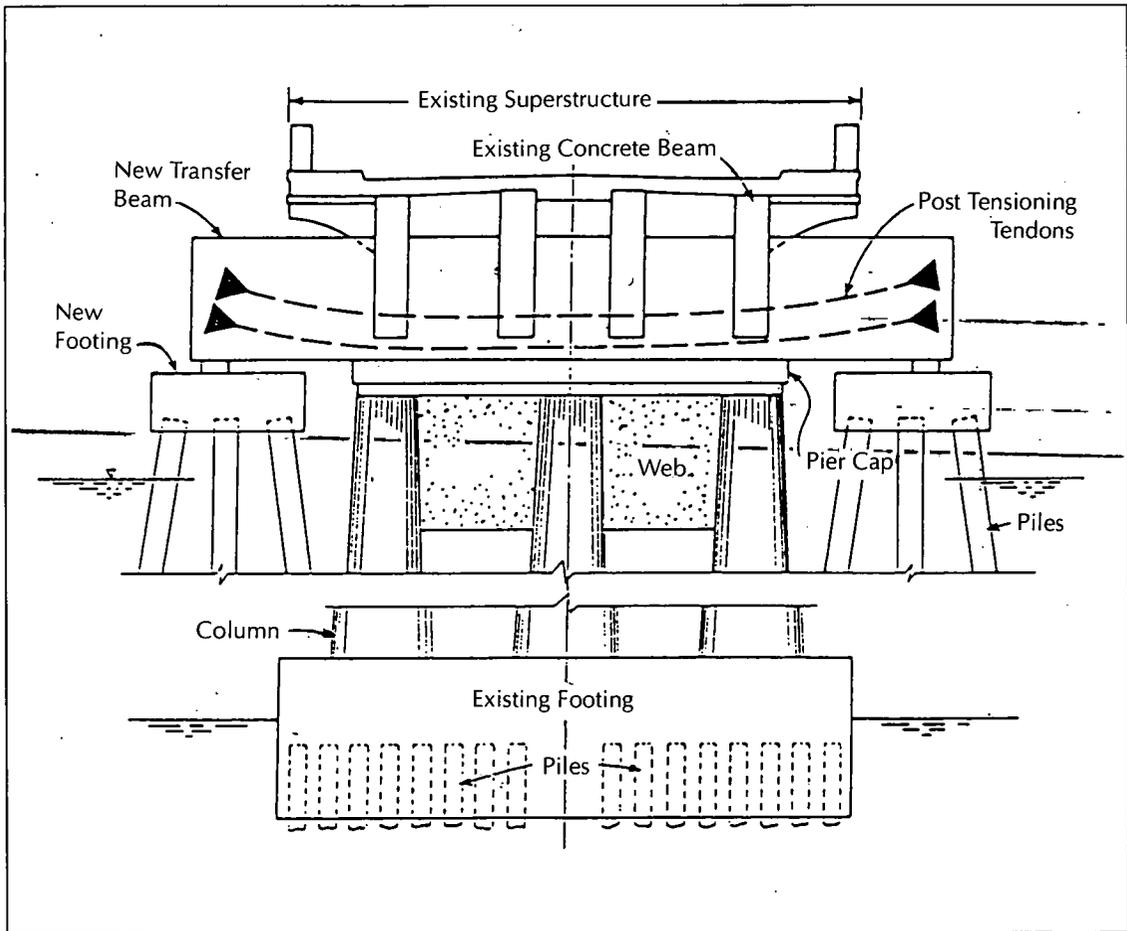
Foundation rehabilitation for the Ashley River Bridge.
